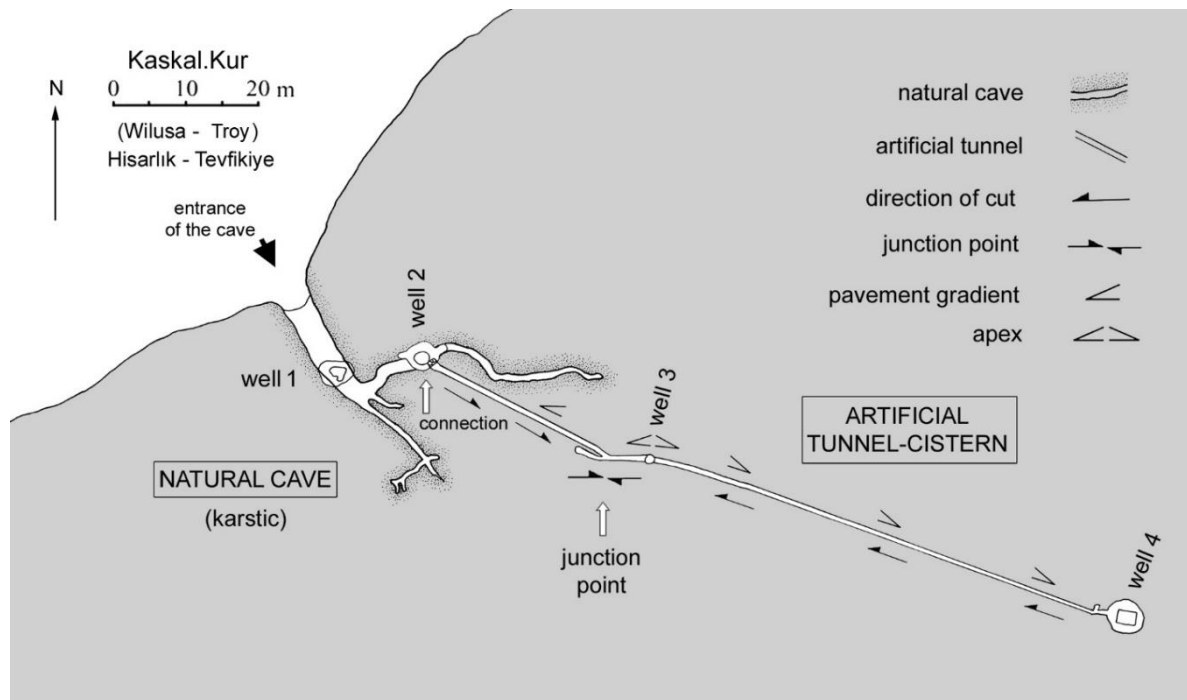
Plan of Troia water supplying tunnel, mixed cavity (R. Bixio, elaboration after M. Korfman 2003)
